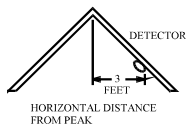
Recommended location to mount smoke detectors in rooms with sloped, gabled, or peaked ceiling
